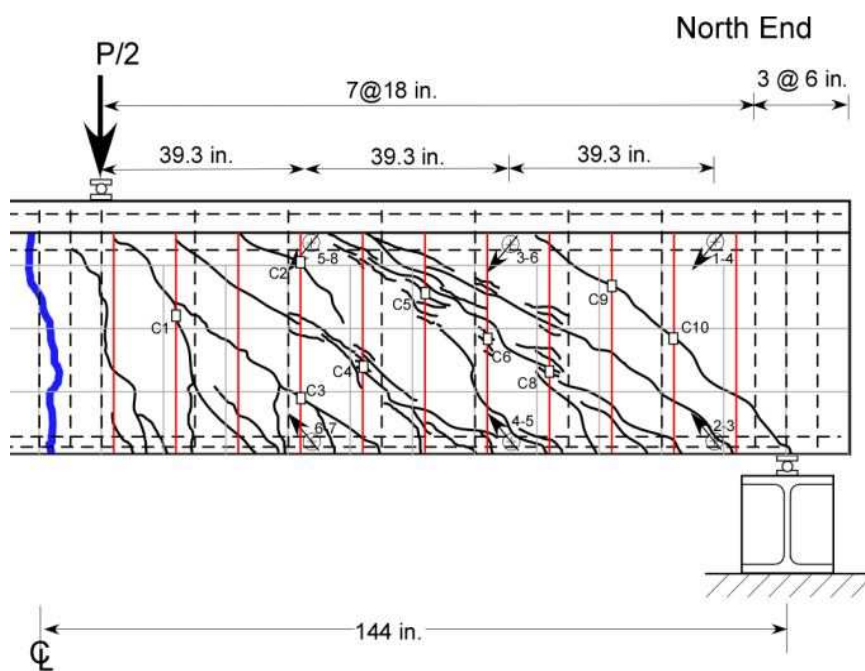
Specimen T.6.18.12.S crack map (failure test)
